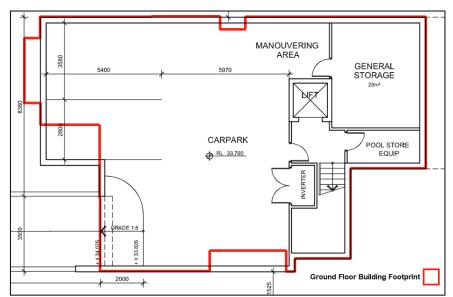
Basement floor plan with ground floor building footprint outlined in red.
